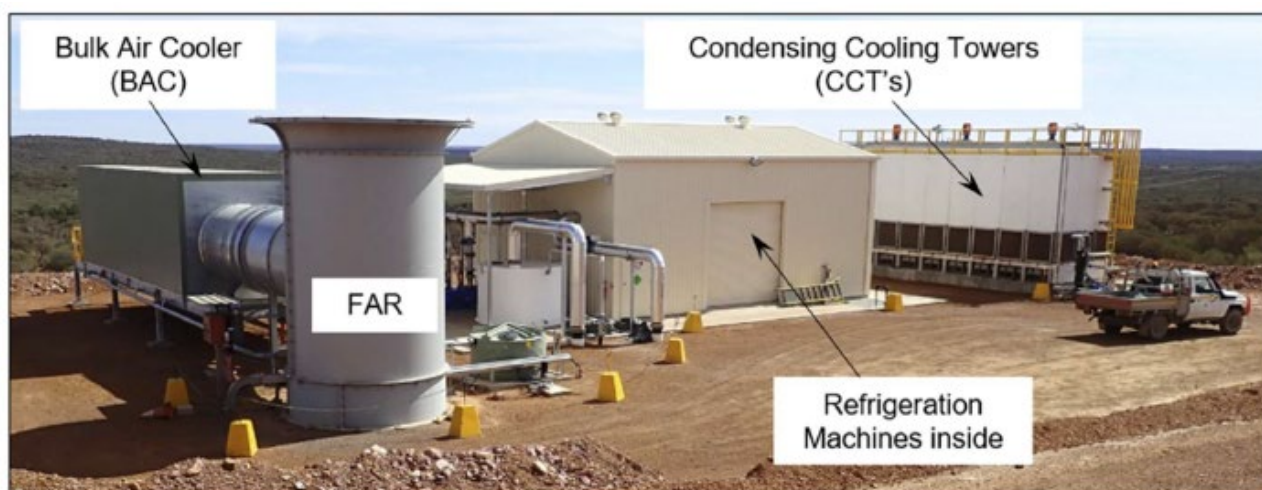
Example of cooling plant proposed for BP33 underground mine
